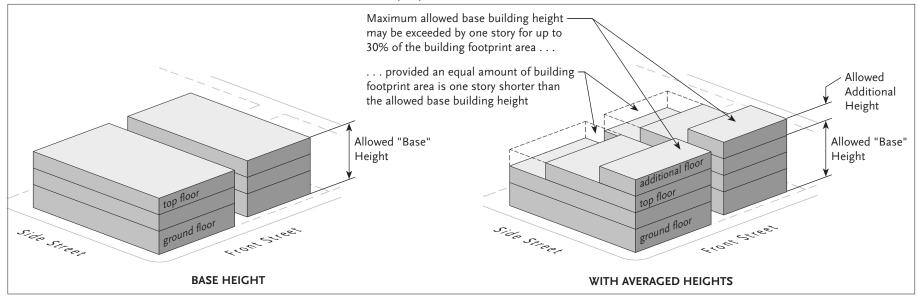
BUILDING HEIGHT AT SIDEWALK
